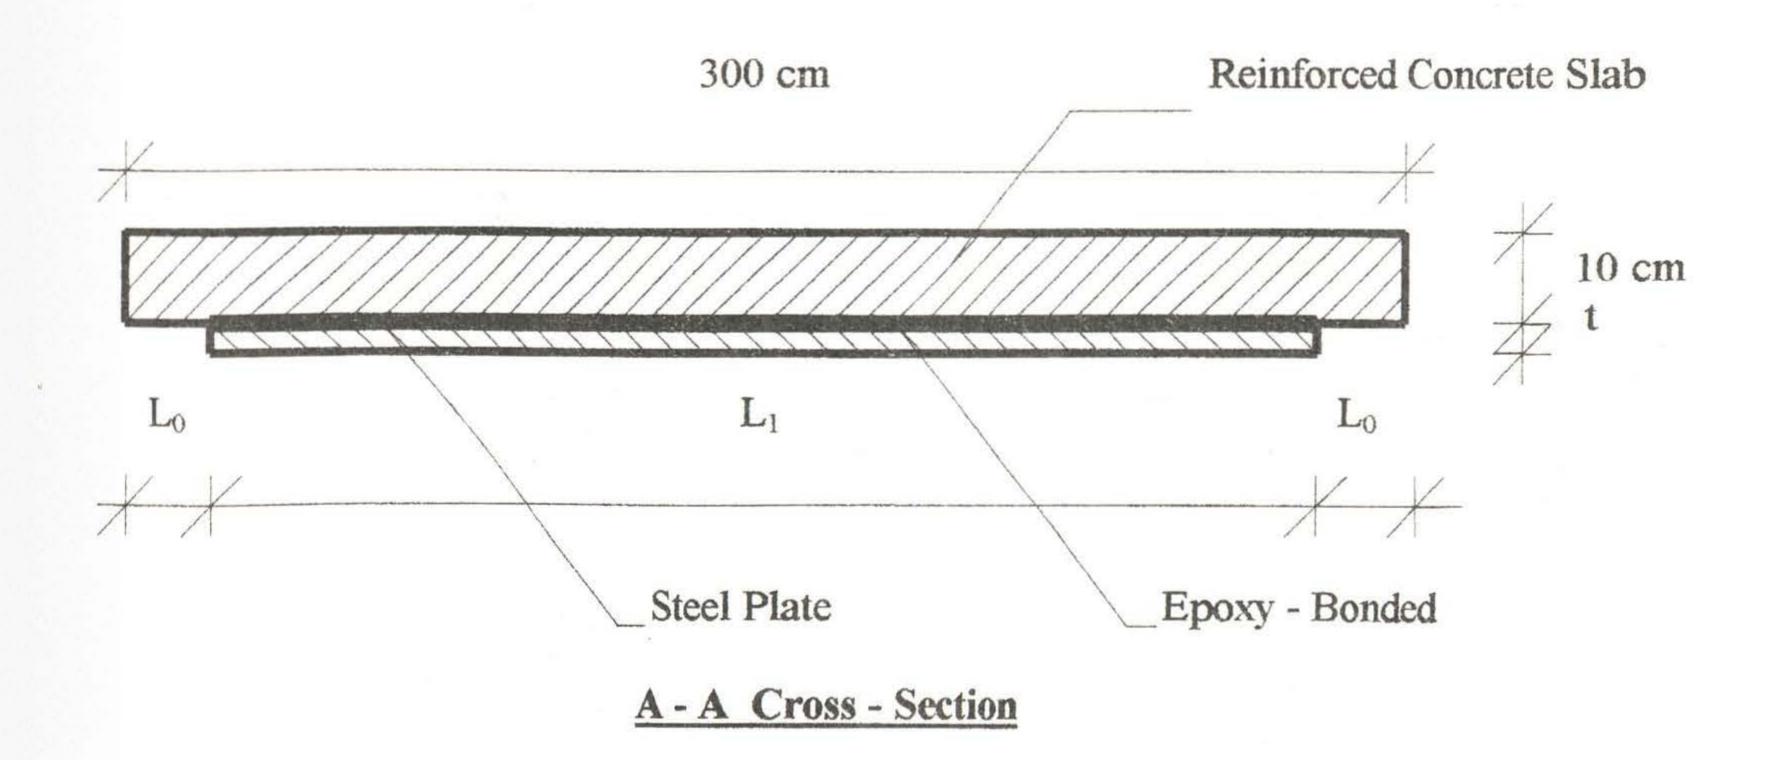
Strengthening of reinforced concrete Slab by thin steel plates glued with epoxy
